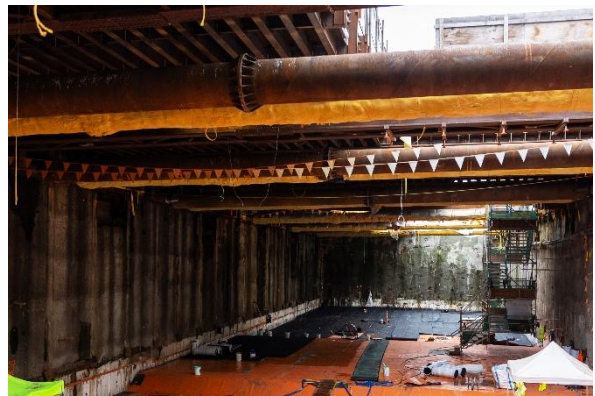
Broadway-City Hall Station: Progressing with waterproofing on the crossover box roof.
